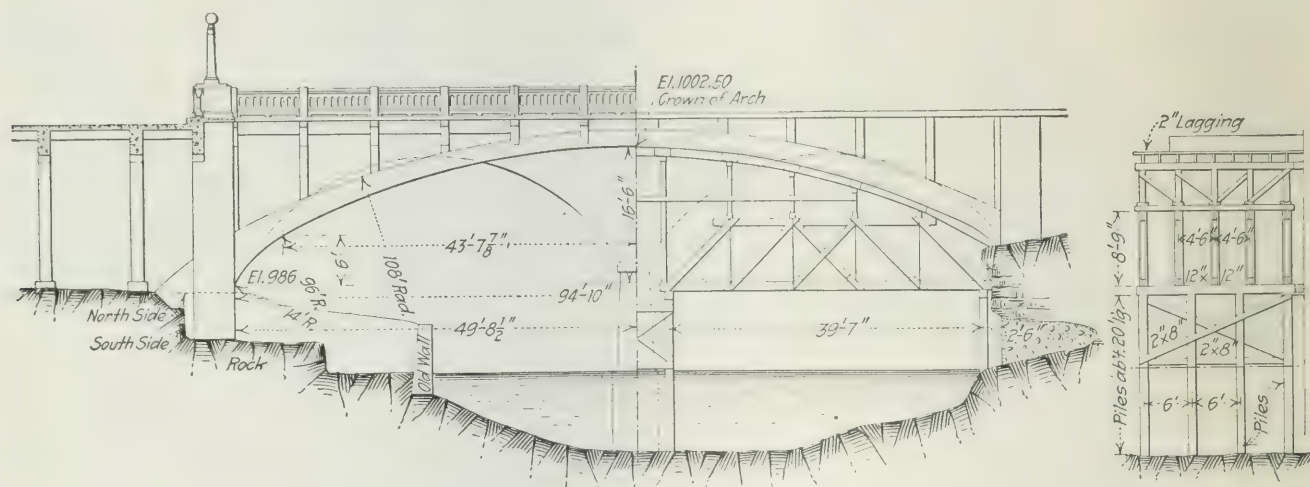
ELEVATION OF PORTAGE ST. BRIDGE, CUYAHOGA FALLS, OHIO, SHOWING OLD AND NEW STRUCTURES AND FALSEWORK
